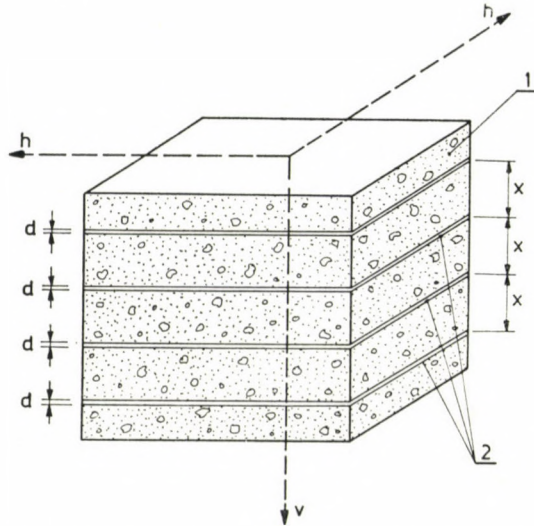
Sketch of the reinforced earth element; 1 — soil, 2 — reinforcing sheets
